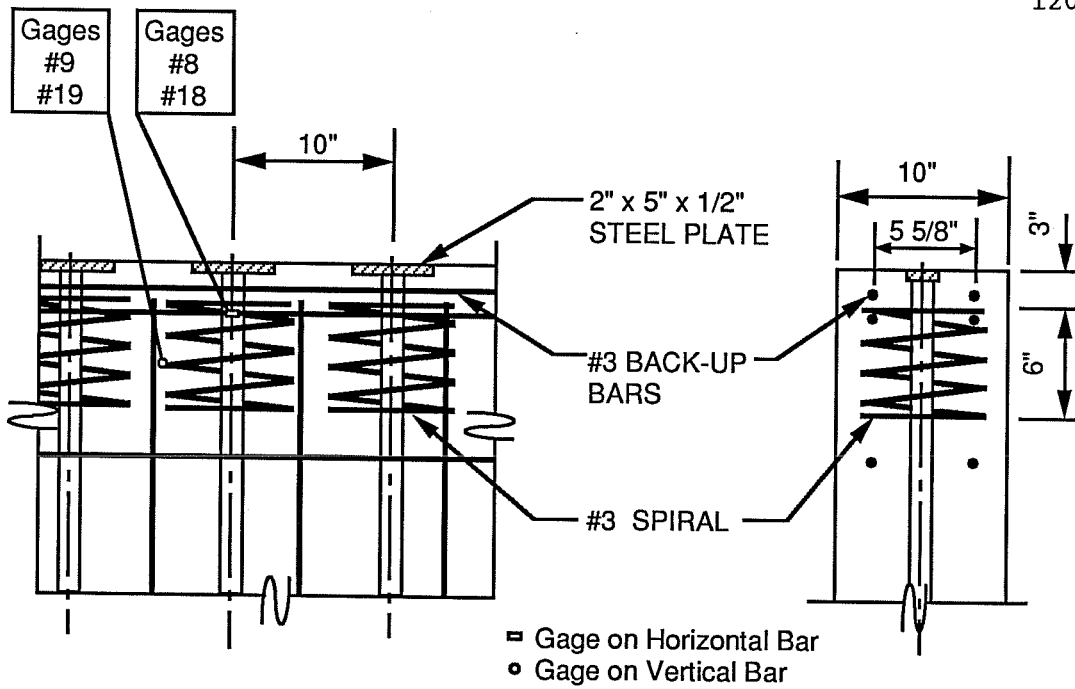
Slab #6 Spiral Detail @ Anchors E & F
